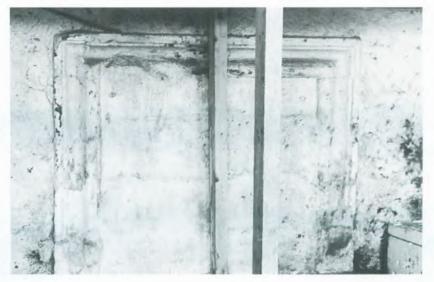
West entrance, Bighouse Lodge. The flanking walls have been raised. 1994.
